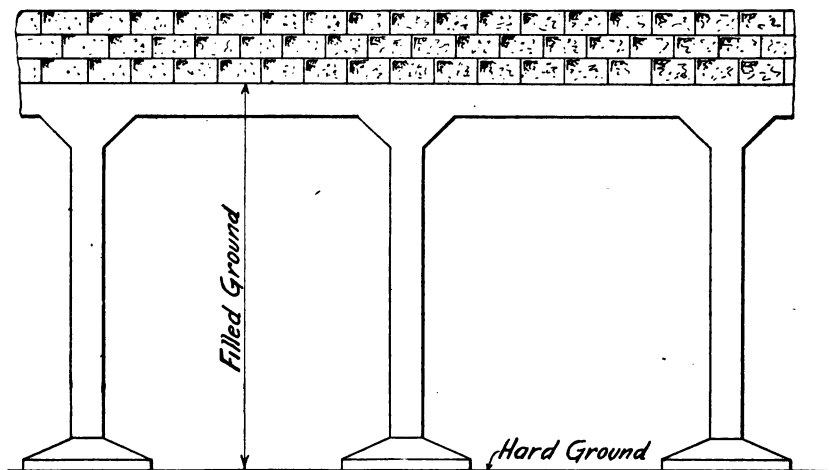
Wall carried on Isolated Reinforced Concrete Piers.
